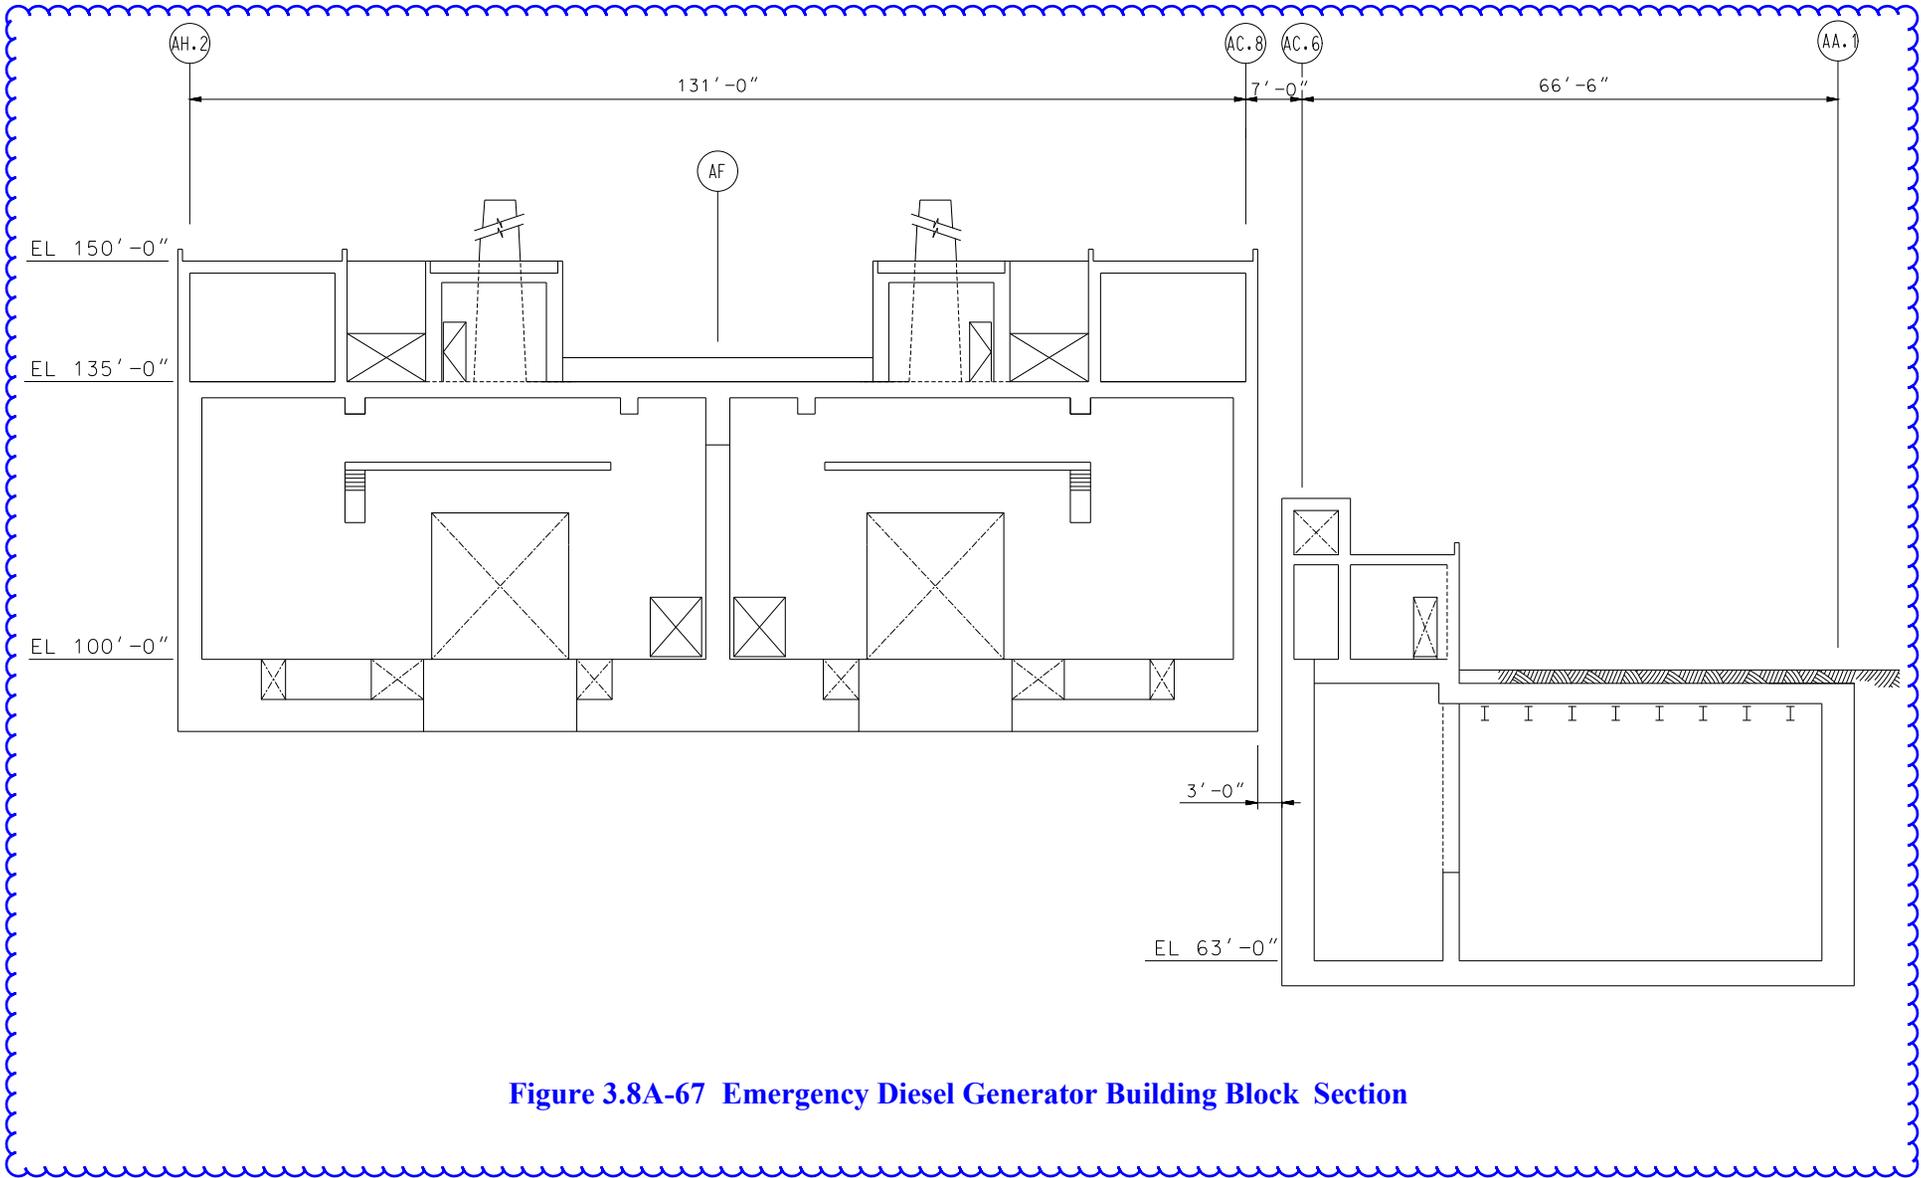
A-67 Emergency Diesel Generator Building Block Section
